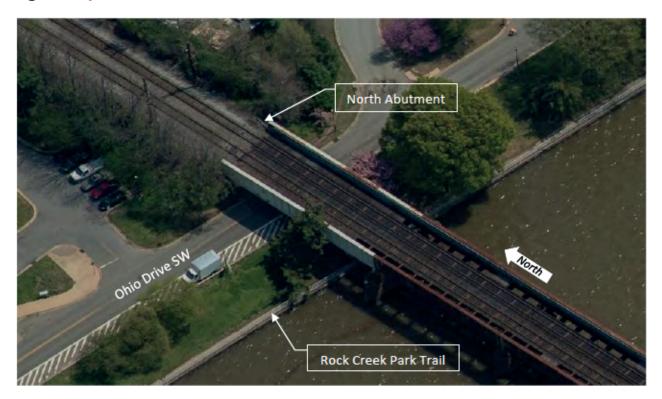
North End over Ohio Drive SW and Rock Creek Park Trail
